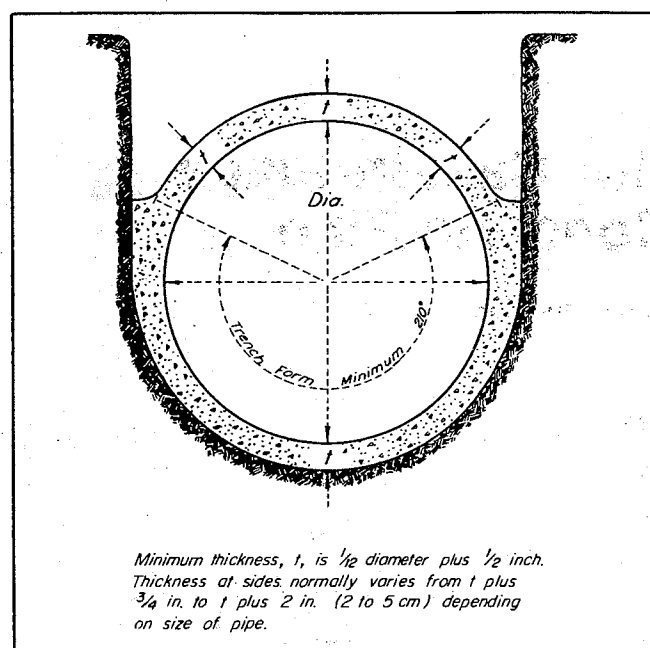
Typical section; 12-120 in. (305-3050 mm) cast-in-place concrete pipe.
